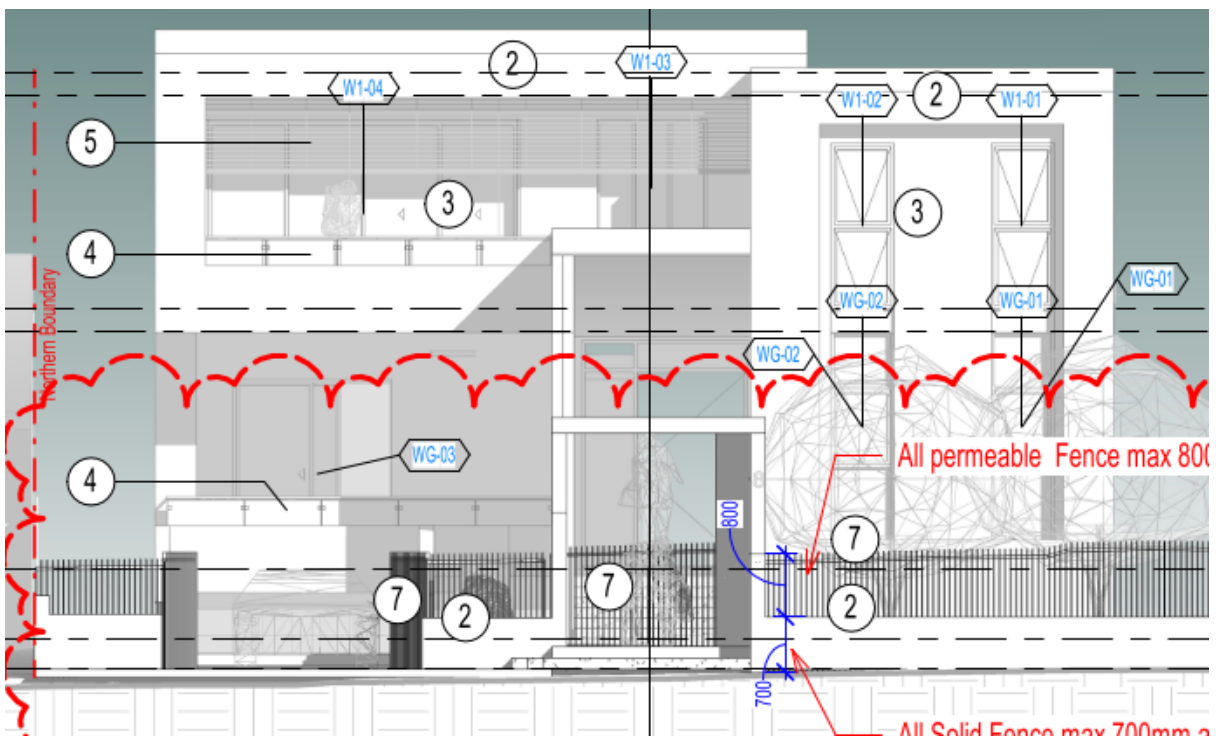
Extract of the proposed western elevation (front façade), drawing no. DA107, revision B, dated 16/06/2021 (source: Licon Consulting).
